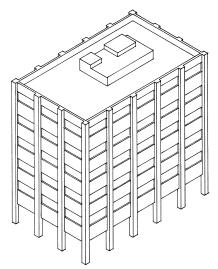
Typical frame structure. Features include: large window spans, window openings on many sides, and clearly visible columnbeam grid pattern.
